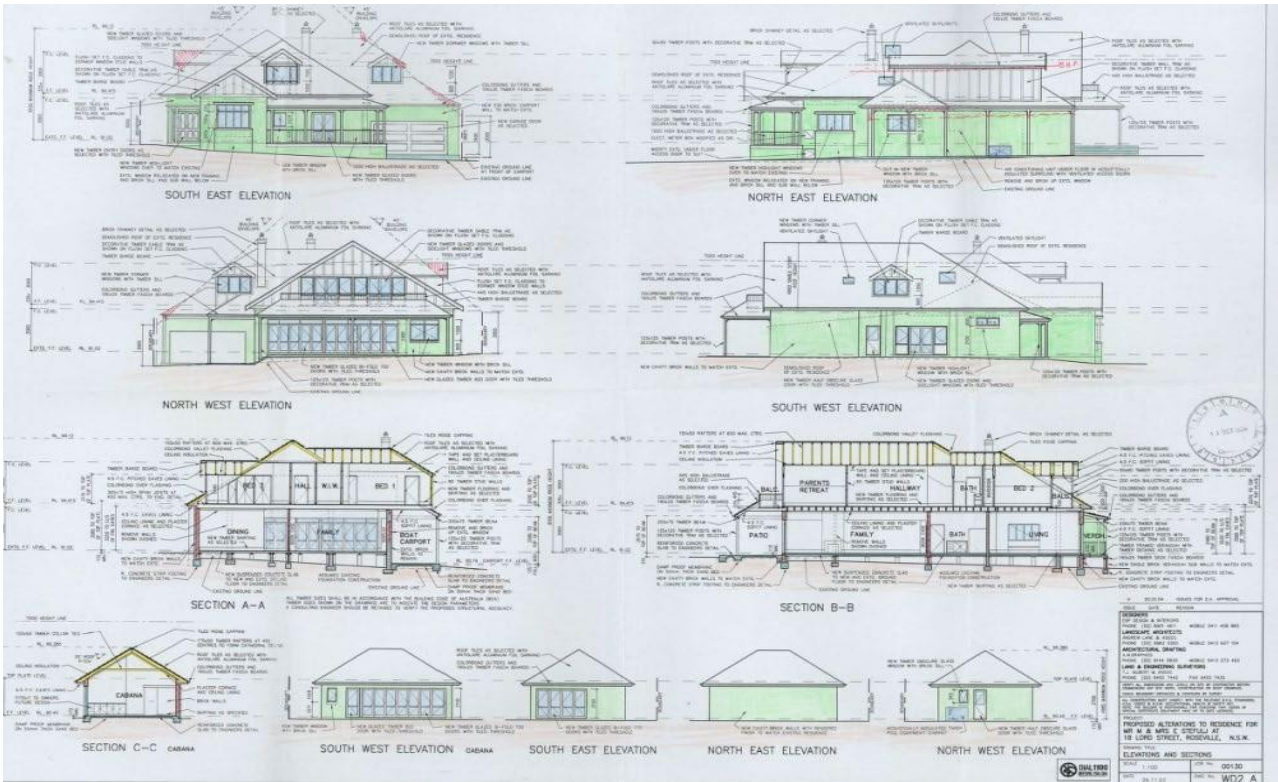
Elevations and Sections for proposed design of unconstructed 2004 proposal
